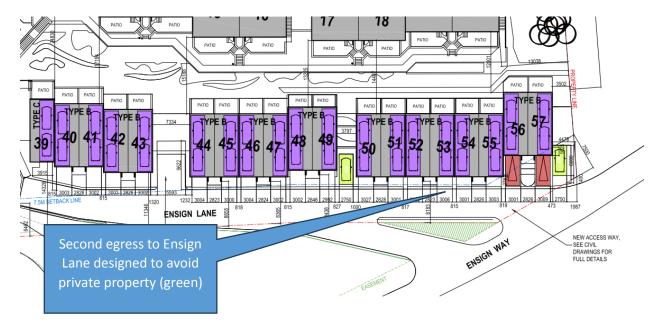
New laneway access to circumvent trespass on adjacent private property.
